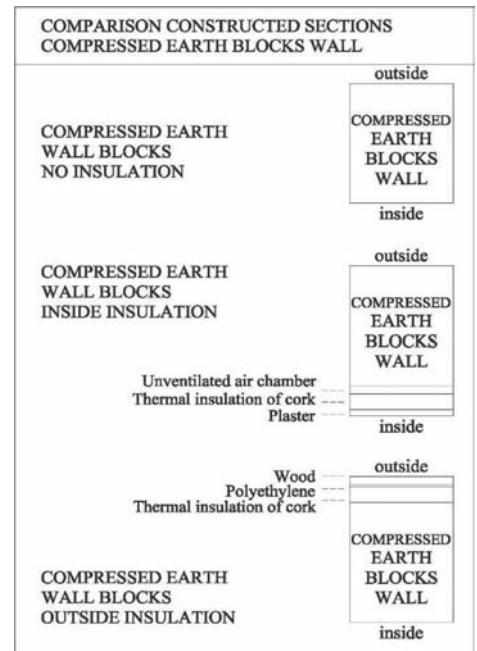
Compared possible sections of a compressed earth blocks wall. Lozano Portillo, A. et al.
